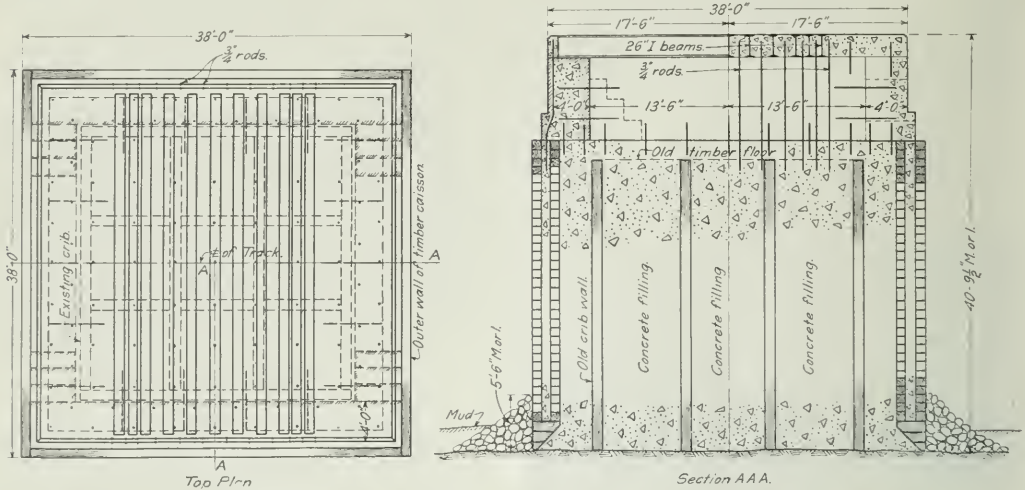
Plan and Section of Caisson for Center Pier of Richelieu River Bridge.
